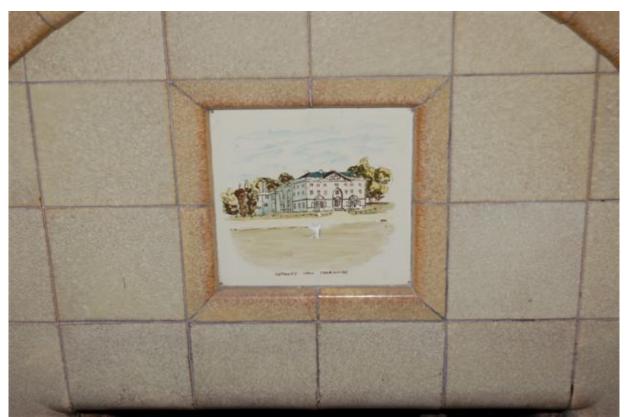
Building B, Block B1; Room BF2 fireplace detail.
